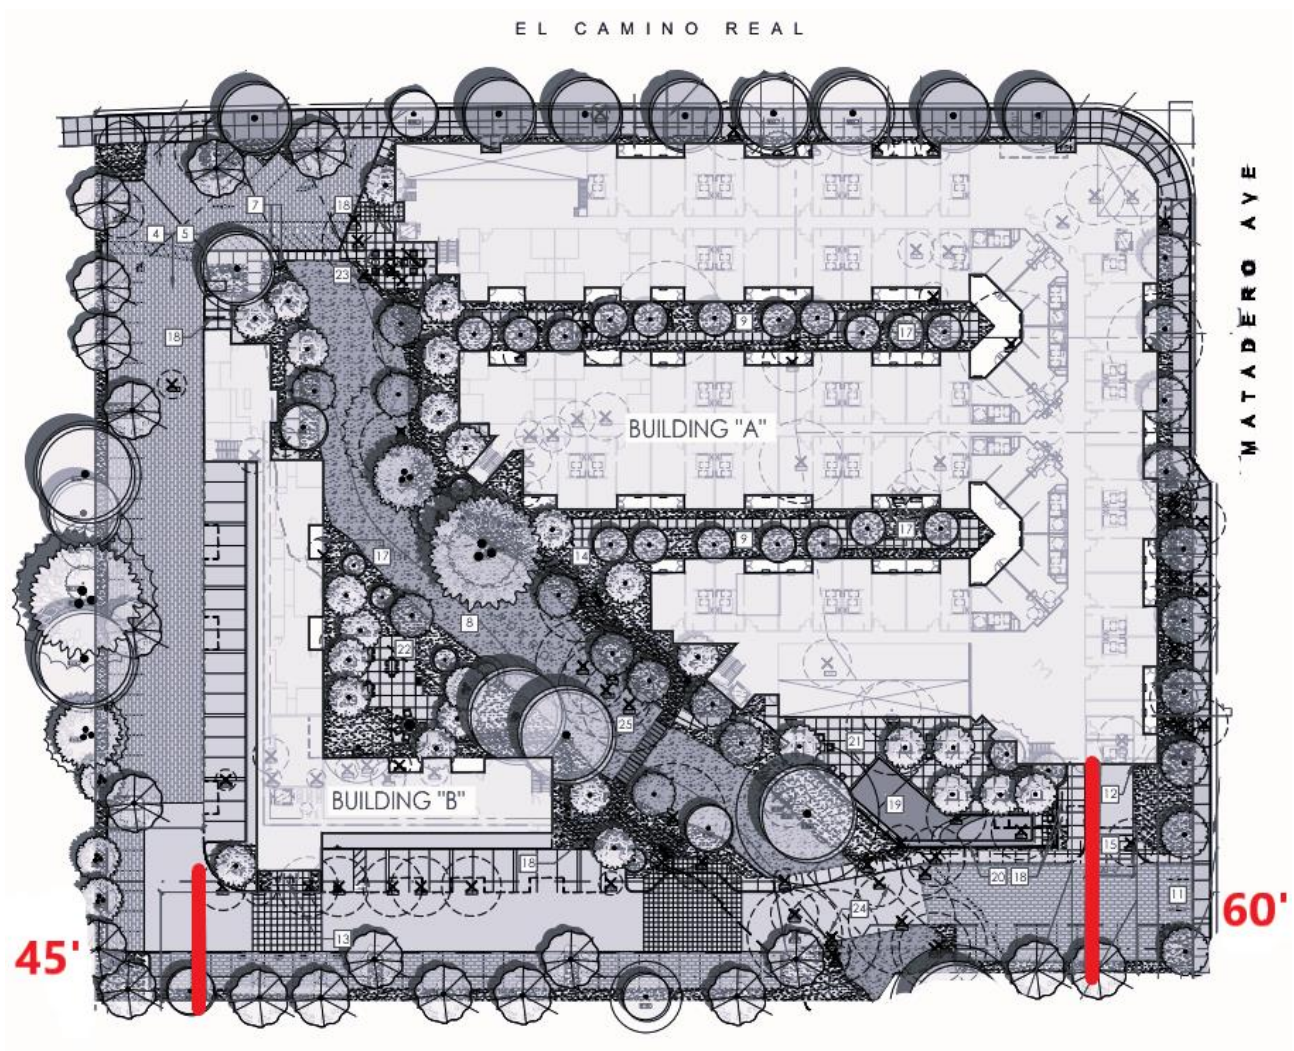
July 2022 Proposed Site Plan, note rear building setbacks
